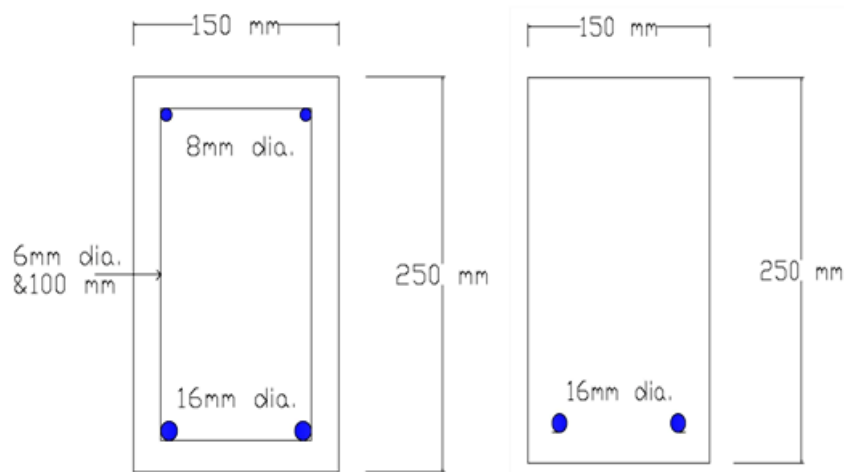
Cross section detail for shear beams, with stirrups (left) and without stirrups (right)
